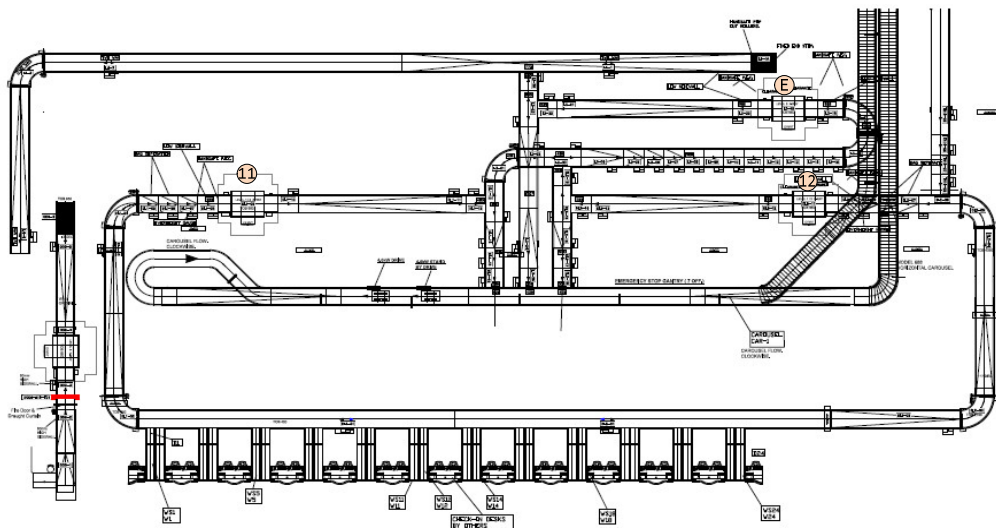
Illustration of Terminal 1 – Area 14 baggage handling installation
